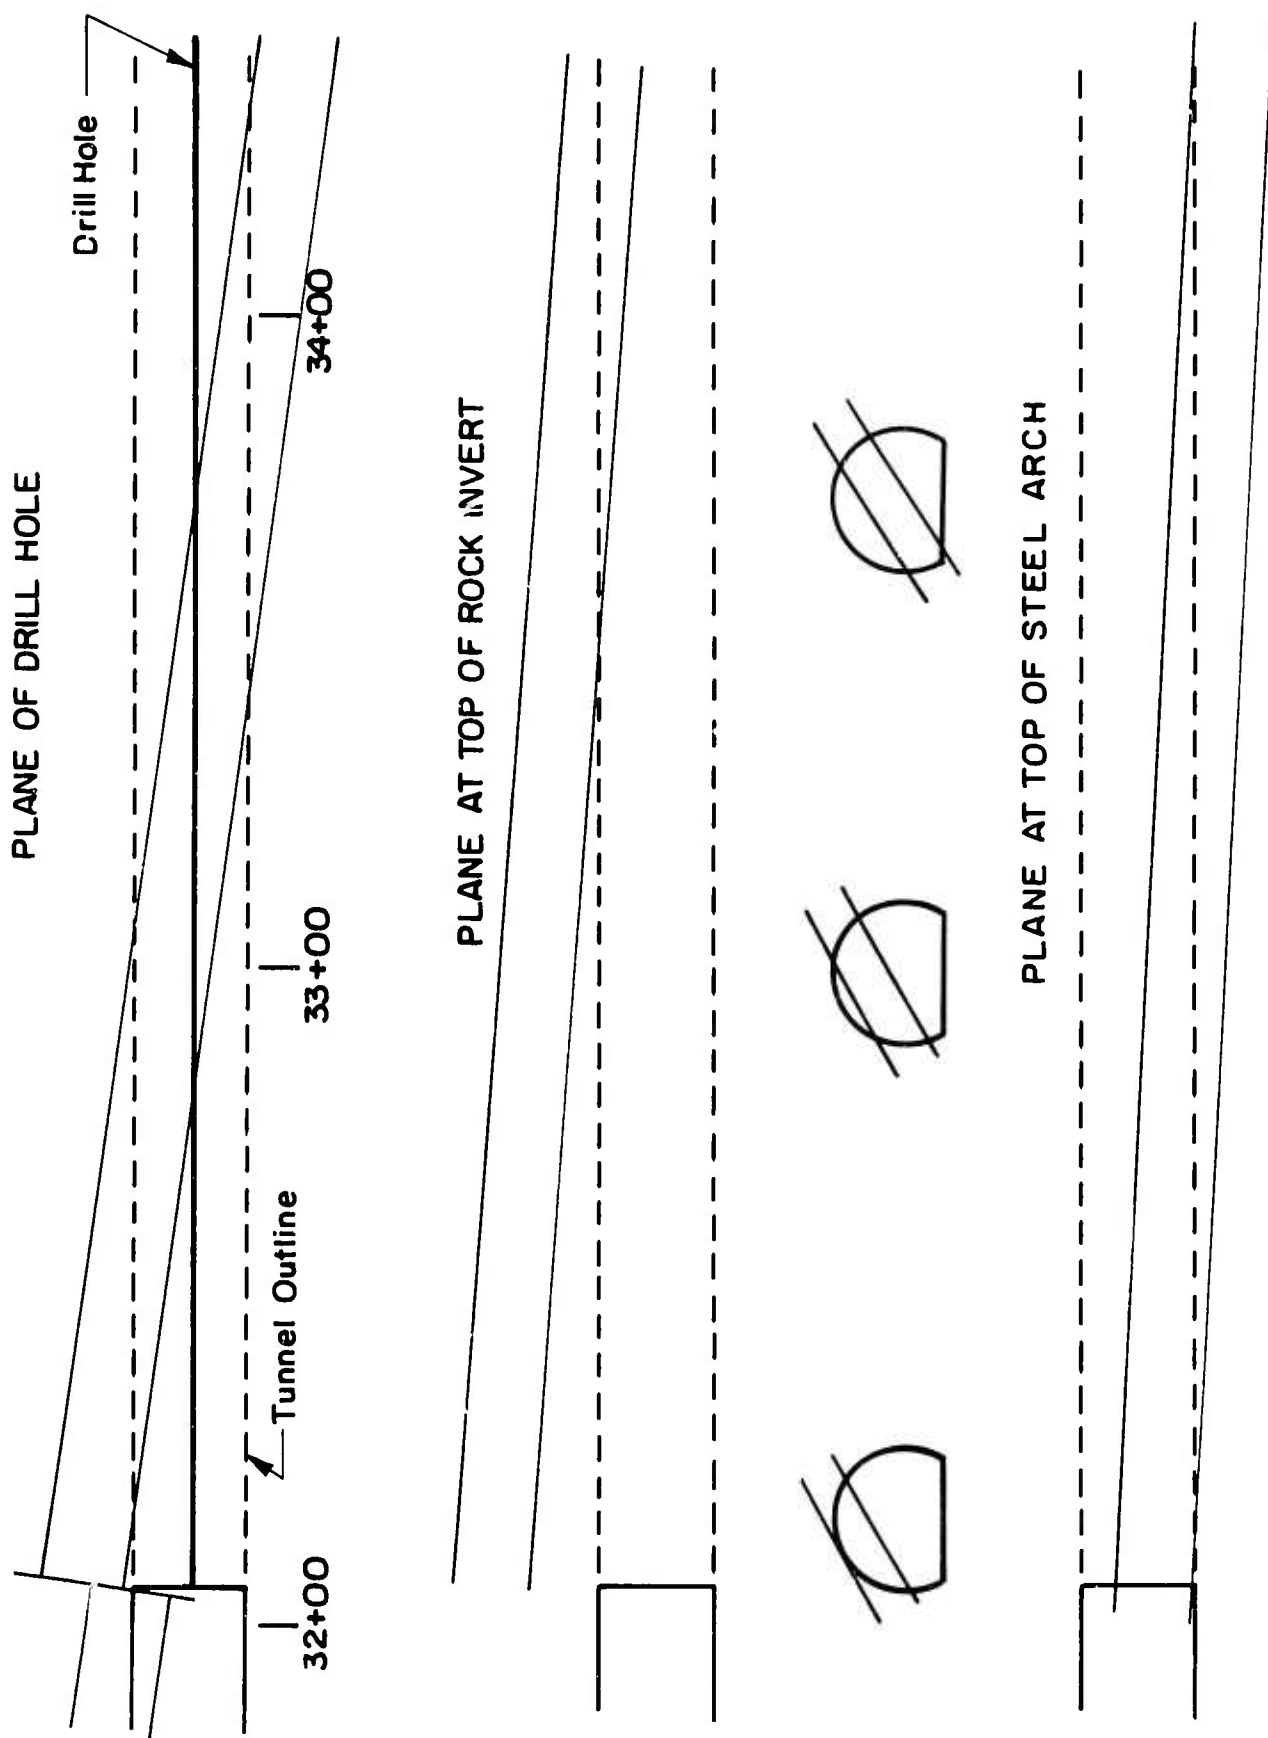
PLAN VIEW OF FAULT ZONE, STATION 32 + 20, HENDERSON MINE HAULAGE TUNNEL (after C. Bellows)
